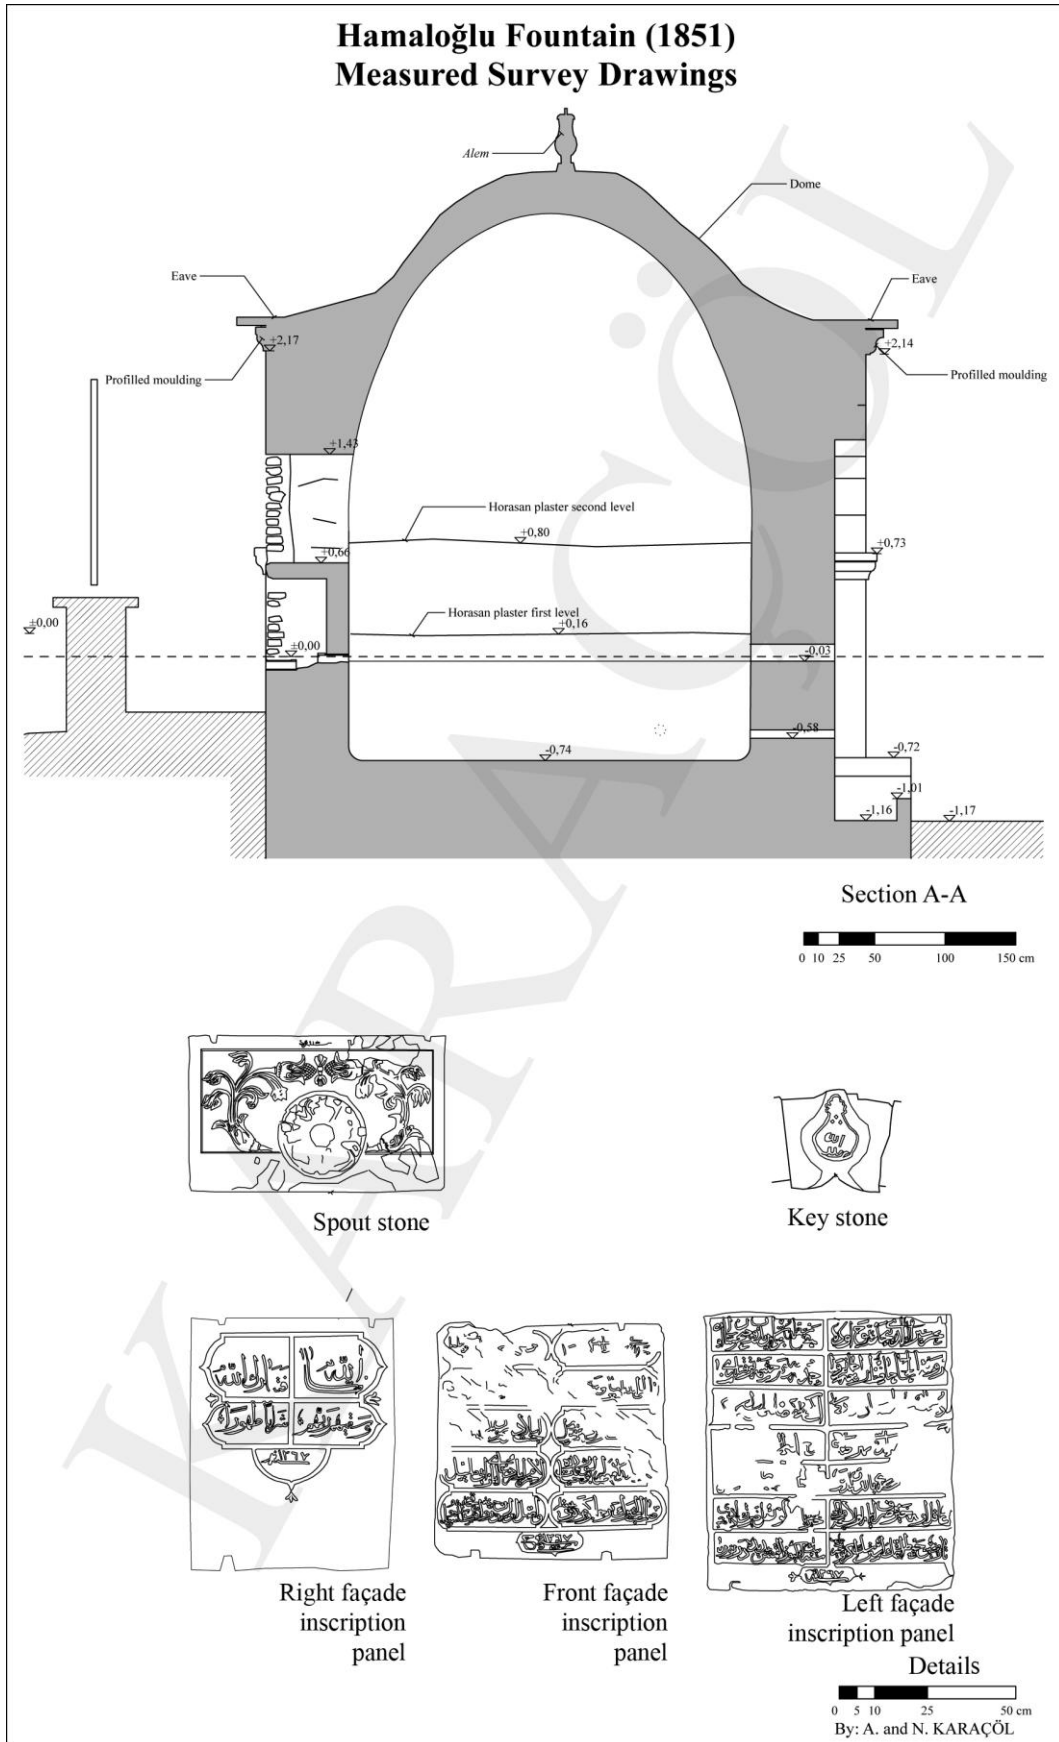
Hamaloğlu Fountain section and detail drawings
